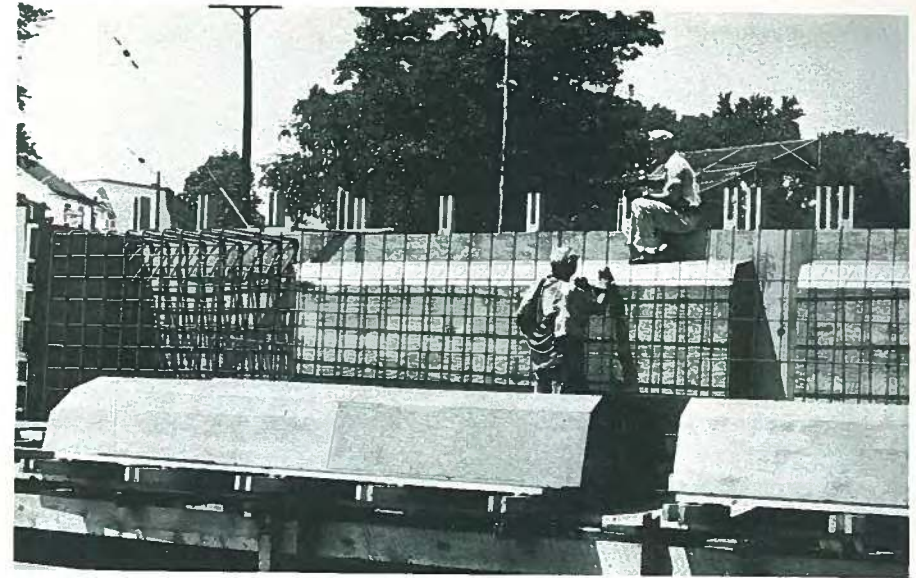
Placing reinforcement in wood forms for Walnut Lane Bridge.
